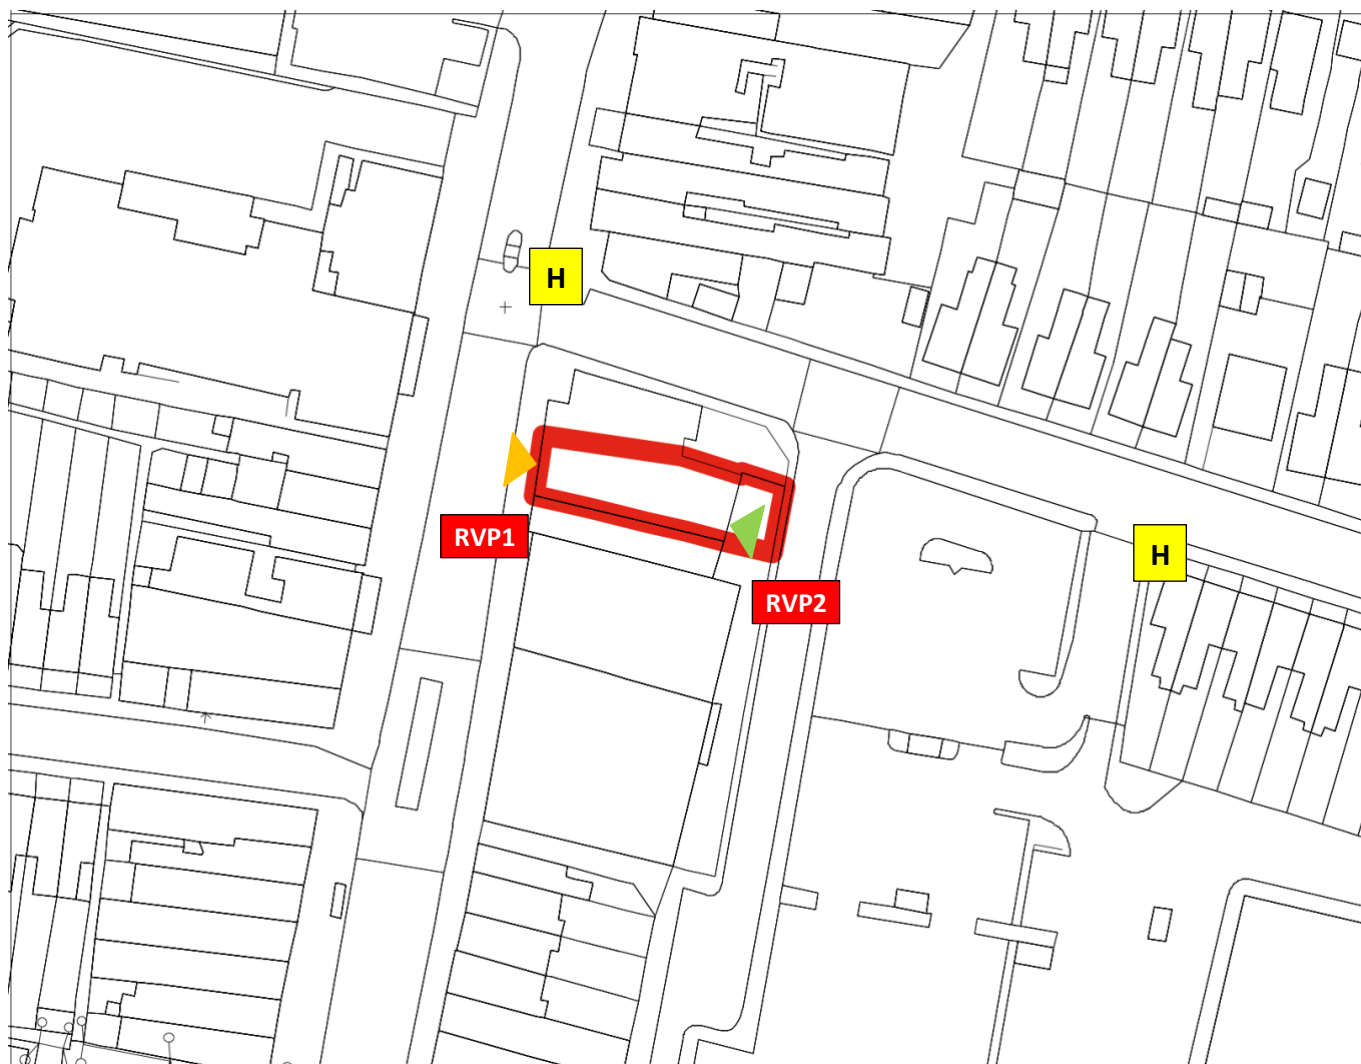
Site Plan showing the footprint of the site in red, the likely FRS RVPs for commercial (RVP1) and the residential (RVP2), the main entrance to HMO units (green) and commercial entrance (orange) and the location of the nearest public hydrants (H - denotes single hydrant).
